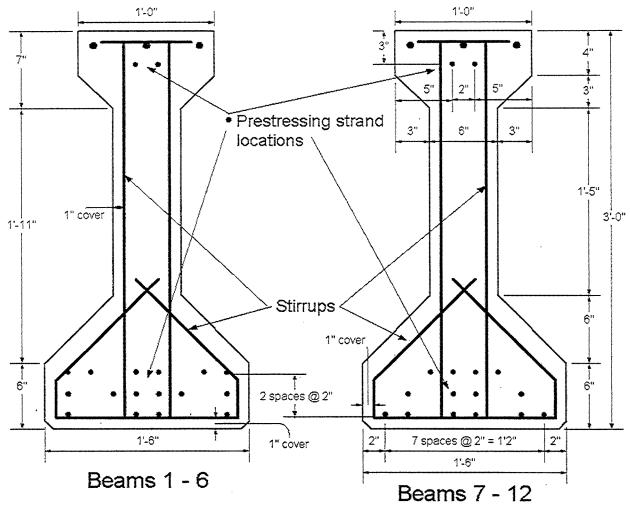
Beam cross sections detailing stirrup and pre-stressing strand locations.
